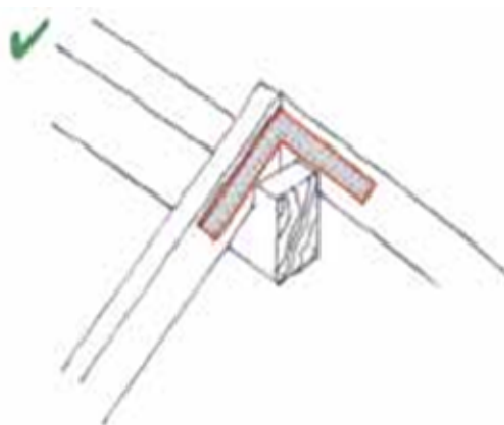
Joints in the wood have to be strong and impregnable; wood-frame has to be properly anchored within the foundation through nut and bolt, so that frame is not de-linked from the base. (Sketch Credit-IFRC)
